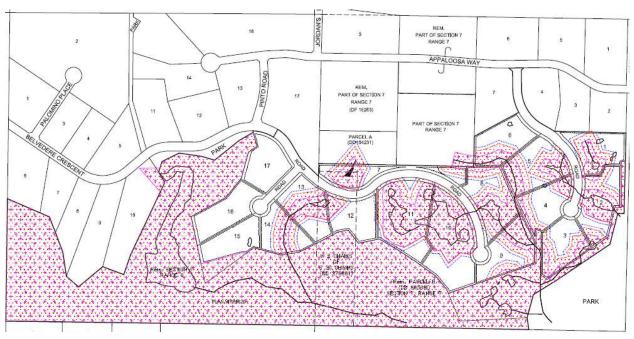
Preliminary Subdivision Plan indicating Riparian Protection Development Permit Setbacks
